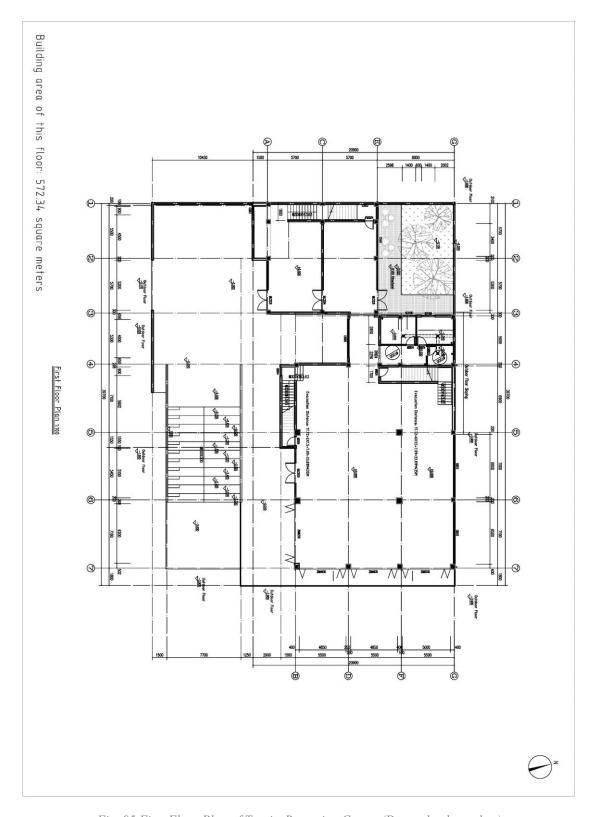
First Floor Plan of Tourist Reception Center (Drawn by the author)
